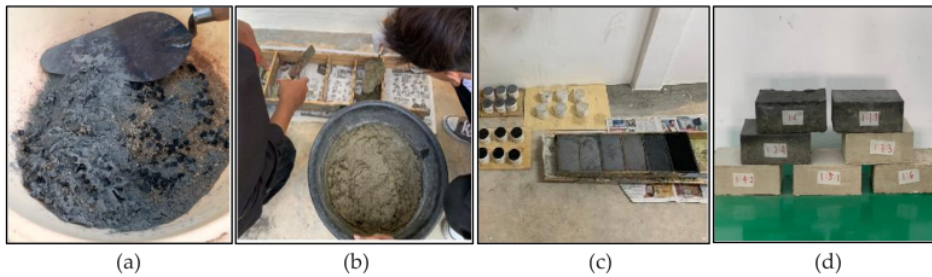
Preparing of RHA brick (a) Mixing Process (b) Casting of Mixture into mould and (c) Shaping process (d) RHA brick samples
